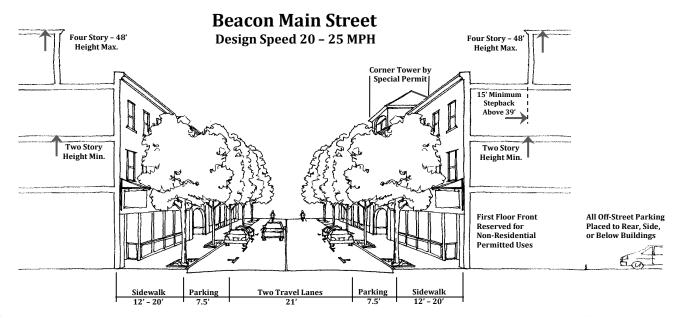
Central Main Street Zoning Requirements Illustrative View
